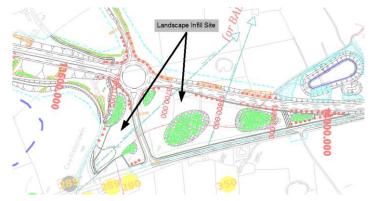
Section of Landscape infill area at Castlebaldwin
